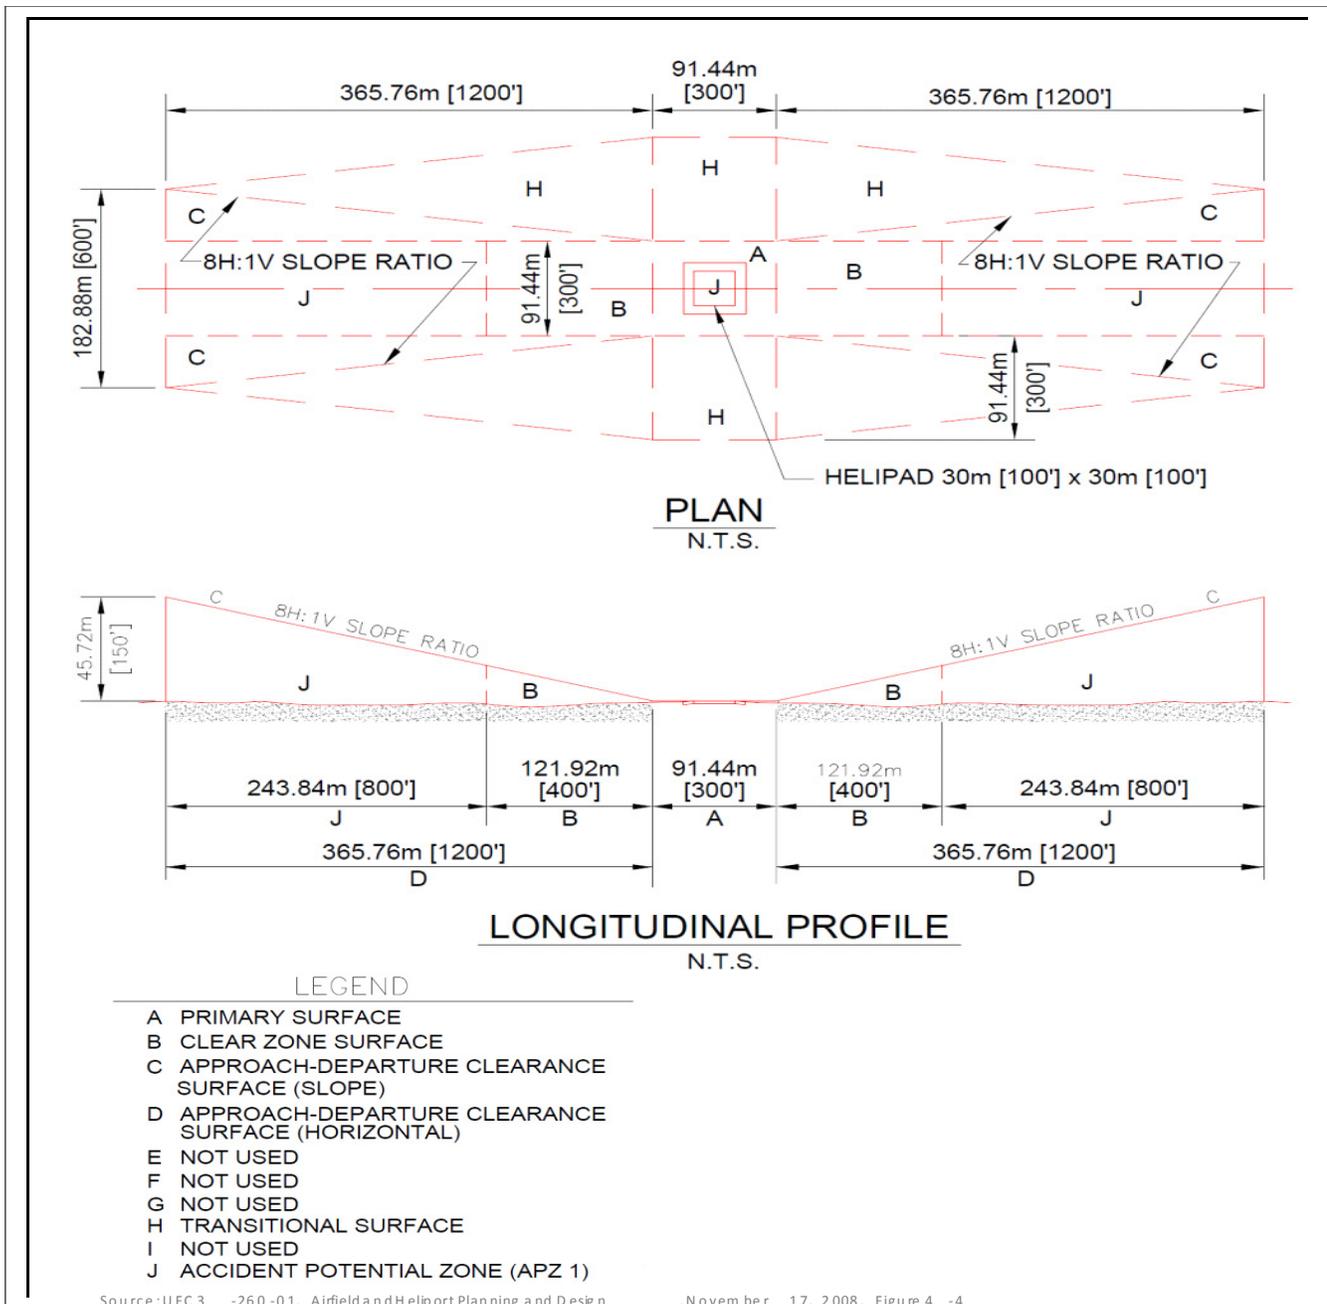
VFR Helicopter Helipad Safety and Imaginary Surfaces
